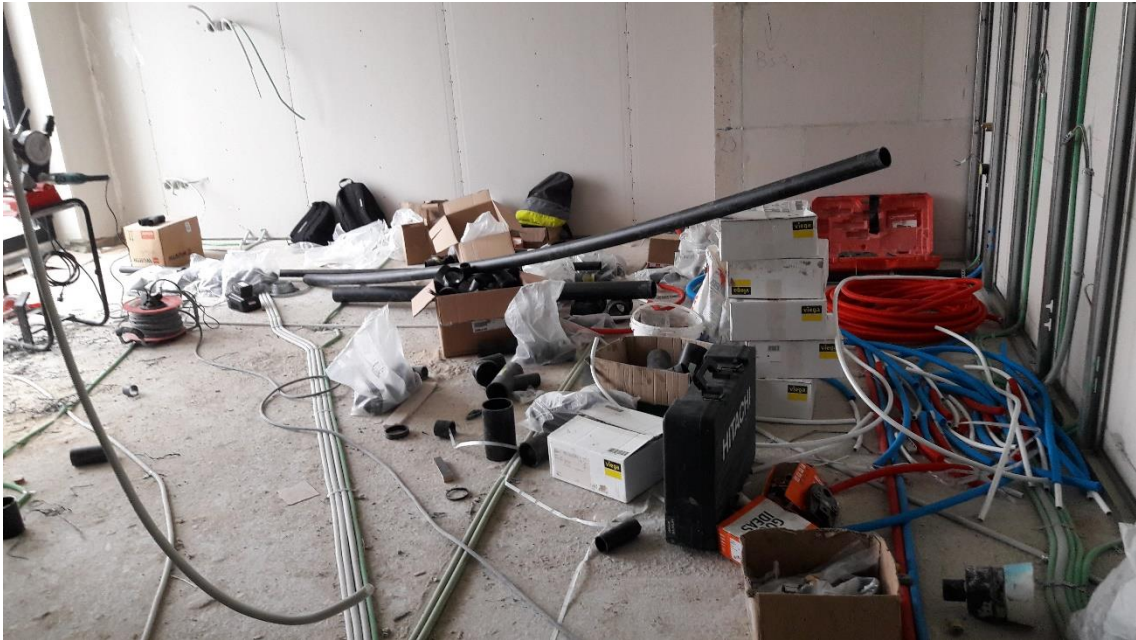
Plumbing materials stored in the middle of a working area (risk of accident) on a construction site
